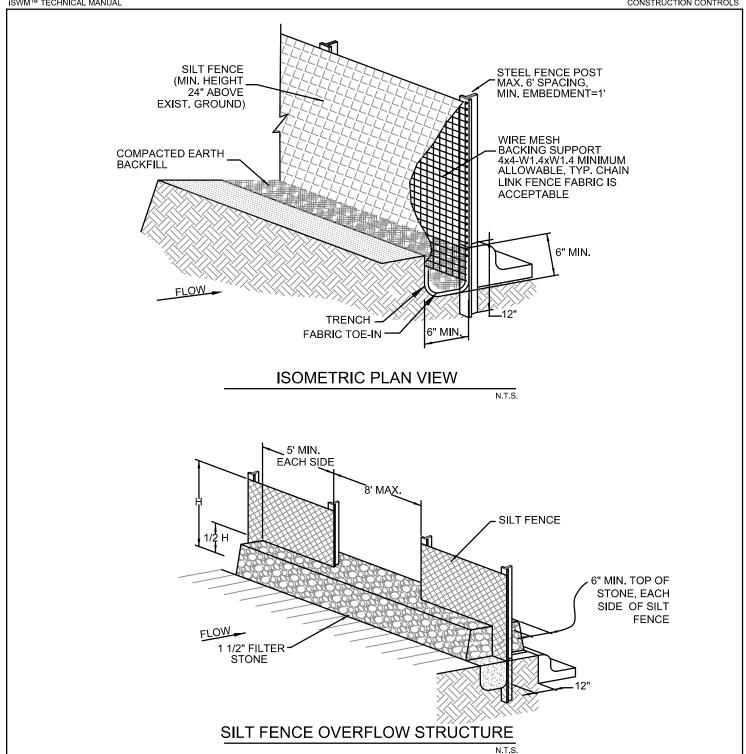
STANDARD CONSTRUCTION DETAIL - FOR SILT FENCE (1 OF 2)
